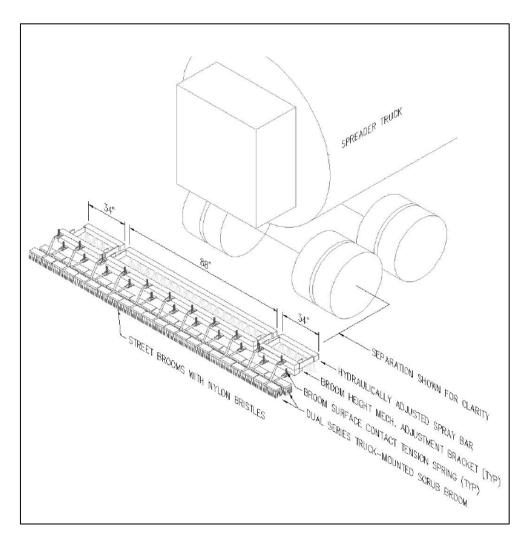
Truck Mounted Emulsion Scrub Broom Assembly
